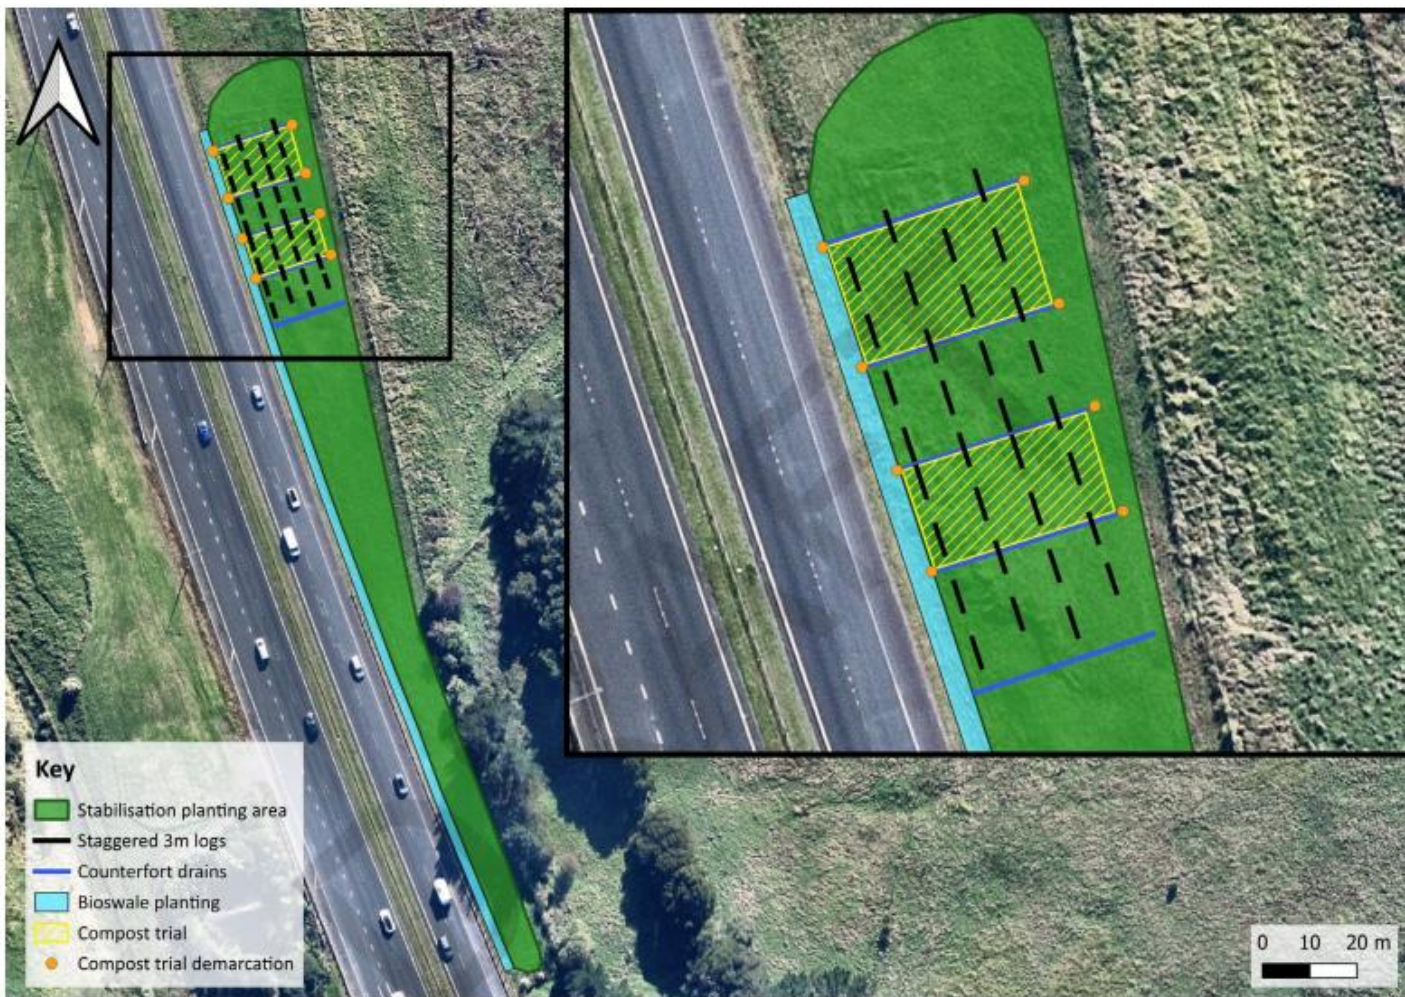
Planting Plan for Wilks Road slope, French drains and swale planting (Viridis 2025)
